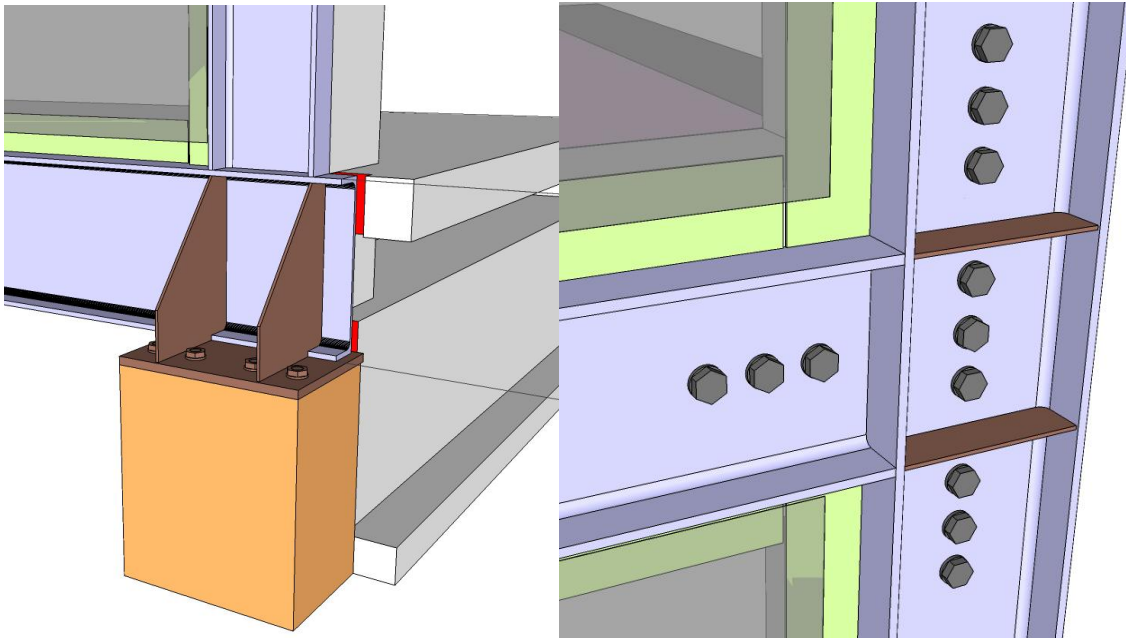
Base and beam-column connection principles for the external frame solution with UPE-profiles.
